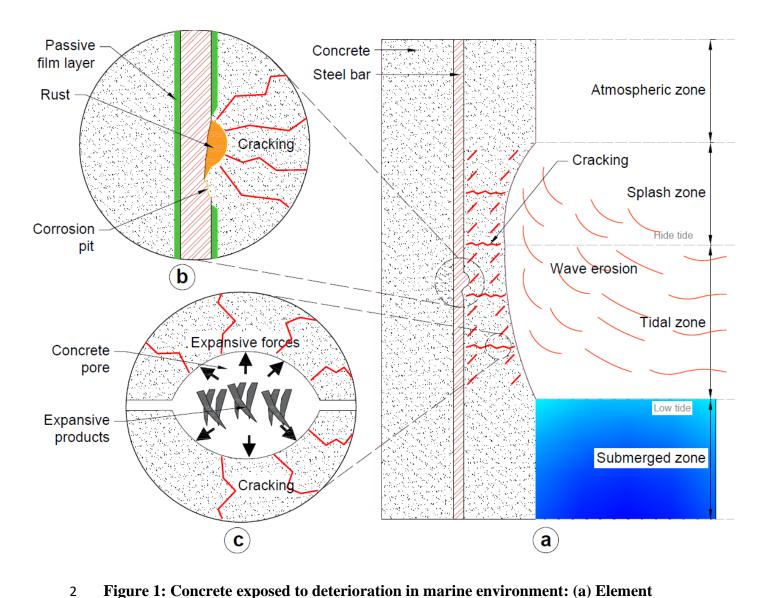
Concrete exposed to deterioration in marine environment: (a) Element of concrete structure, (b) steel corrosion and (c) damage by expansion (Mehta and Monteiro, 2006)
